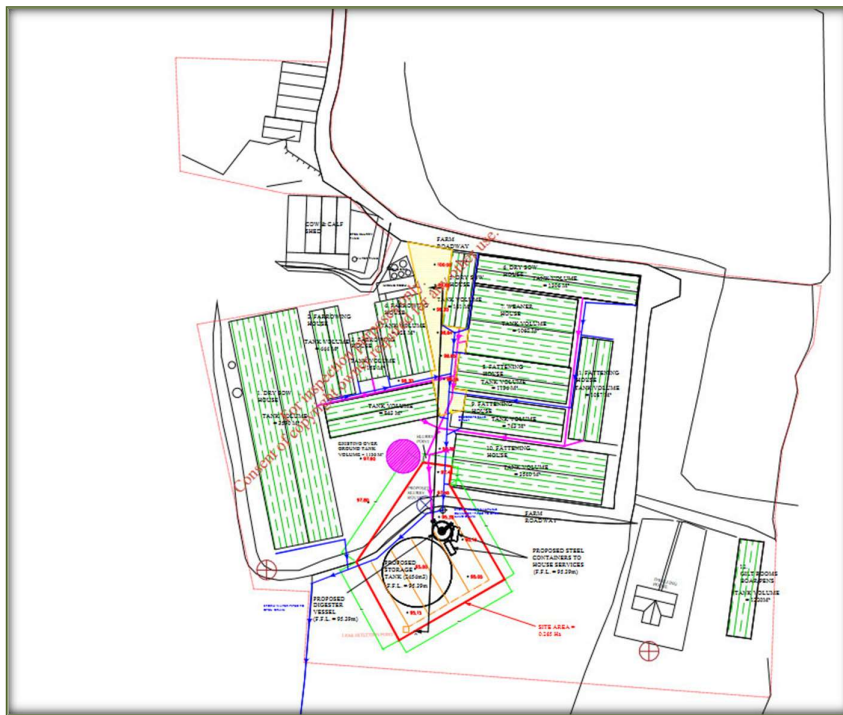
Proposed Site Plan (as prepared by David Leonard)
